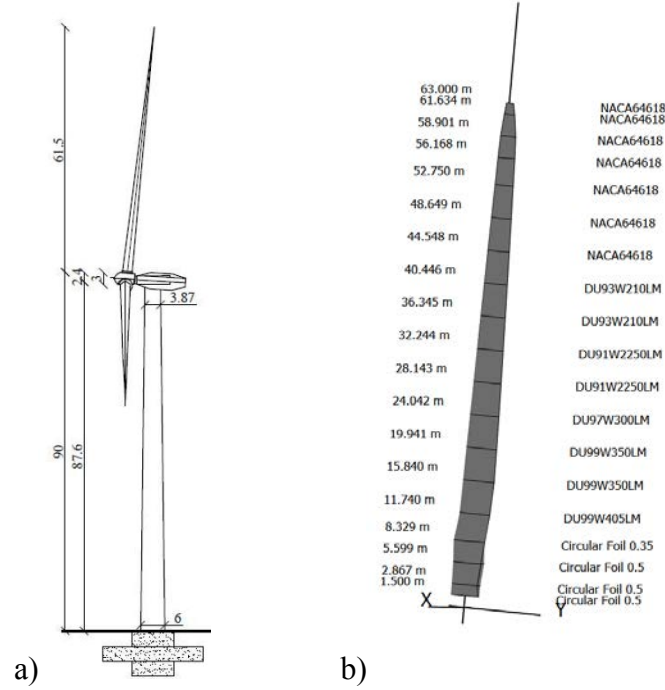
NREL 5 MW wind turbine. a) Lateral view of Tower (dimensions in m); b) rotor-blade, with type of aerofoil used
